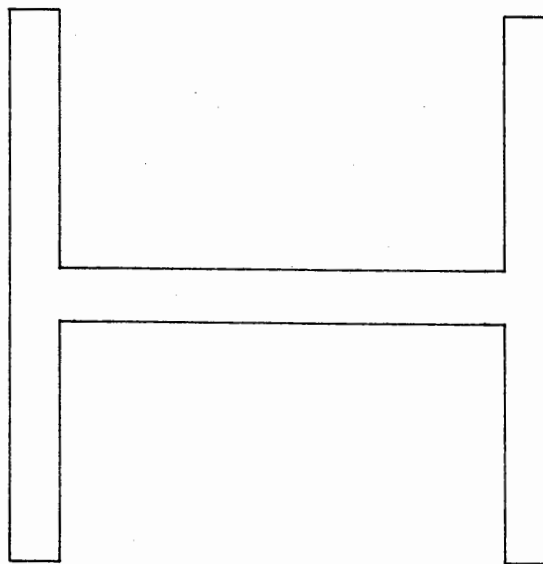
Sheet used for the calculation of pile cross sectional area lost.
